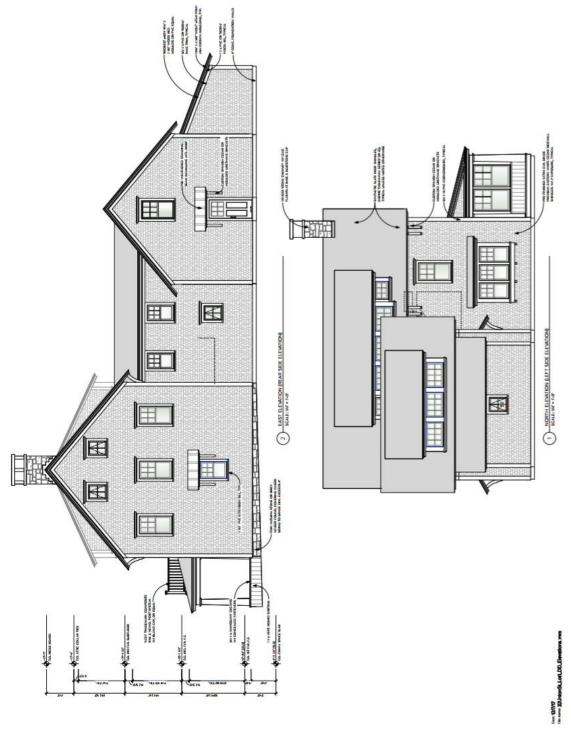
PROPOSED ELEVATIONS OF THE SINGLE FAMILY HOUSE ON LOT 1 - BEACON AVE.
